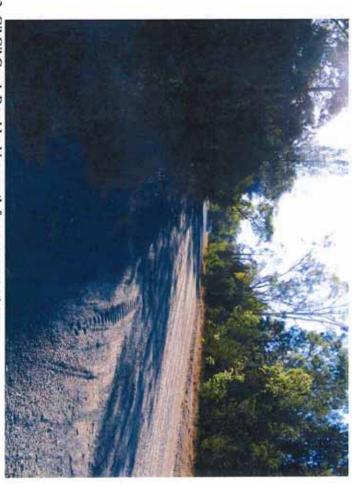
Gil Gil Creek Road looking south from quarry entrance
